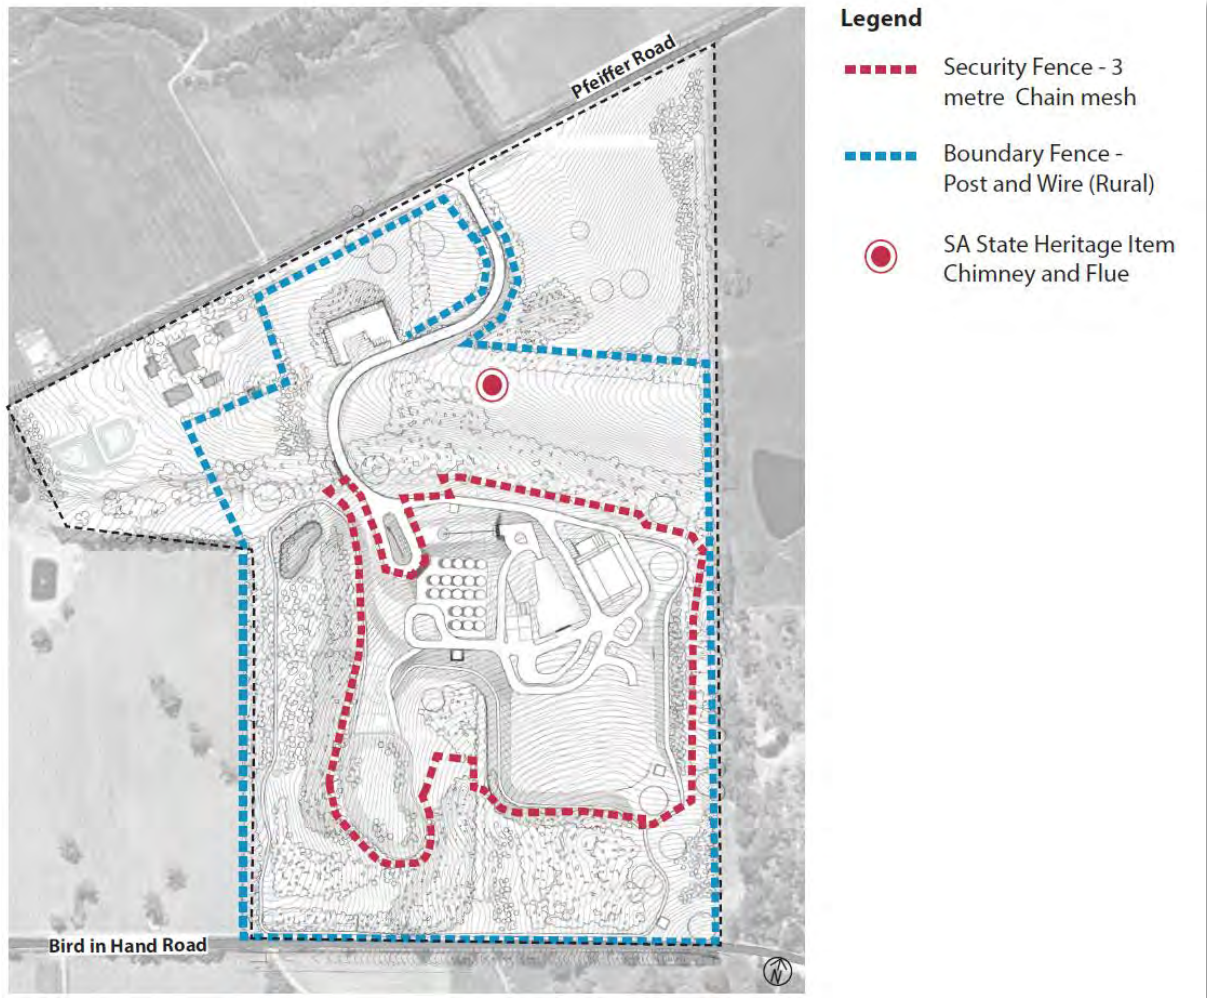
| SITE FENCING (APPENDIX G1)
